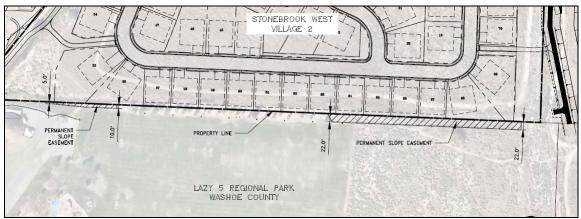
Permanent slope easements to the west and east of the existing trees
